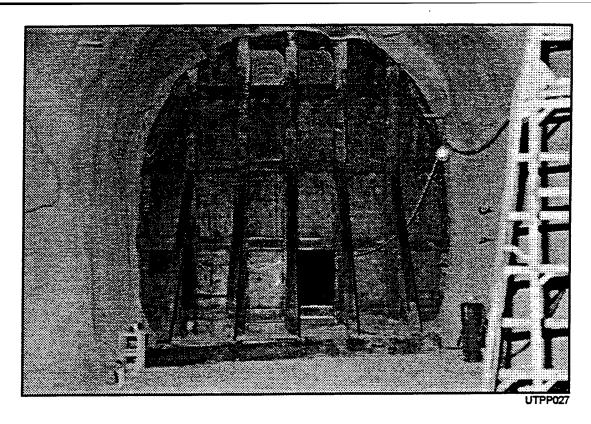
Back of Lower Bulkhead Prior to completion. Shown are Supports and Access Opening
